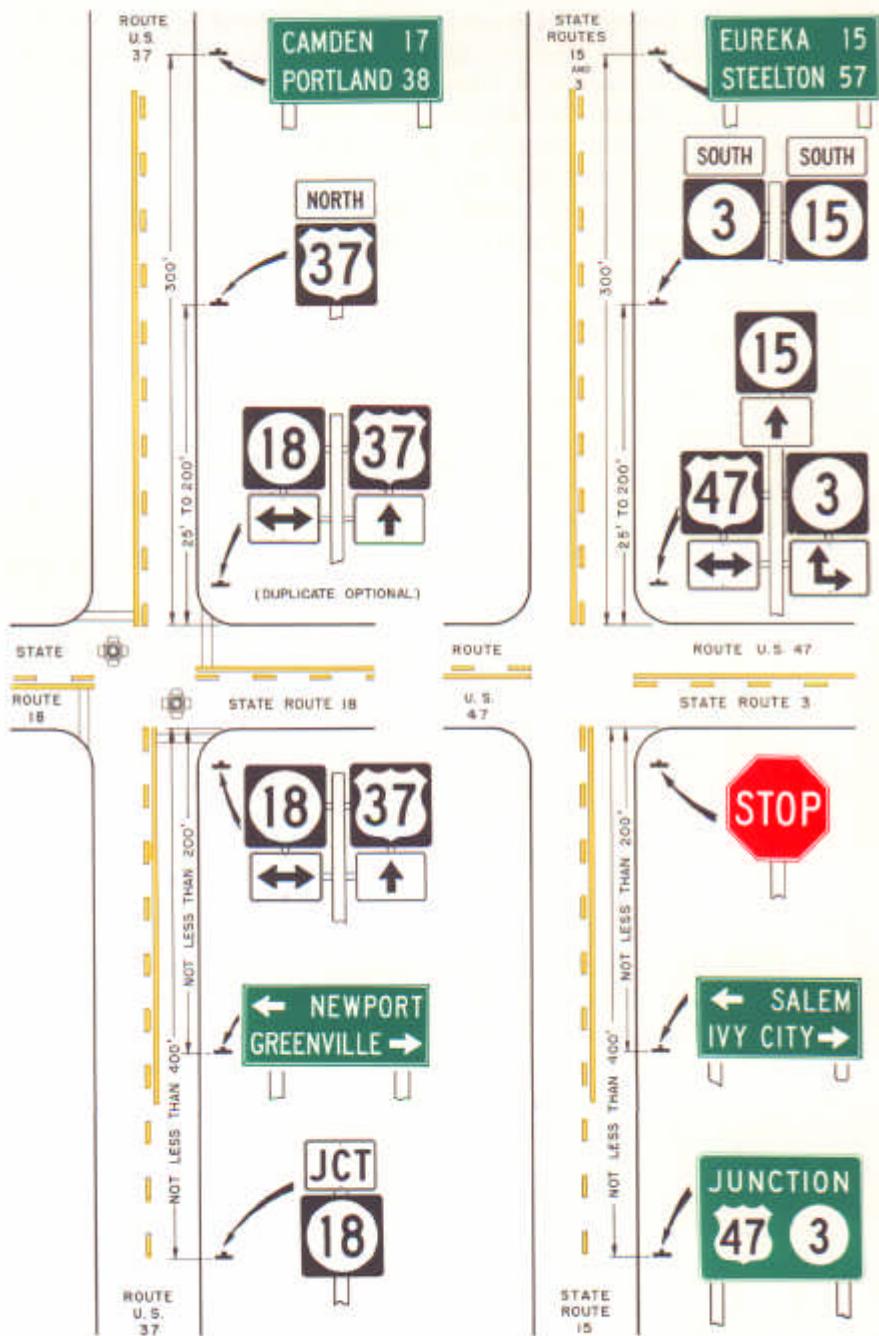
Typical route markings at rural intersections (for one direction of travel only).
